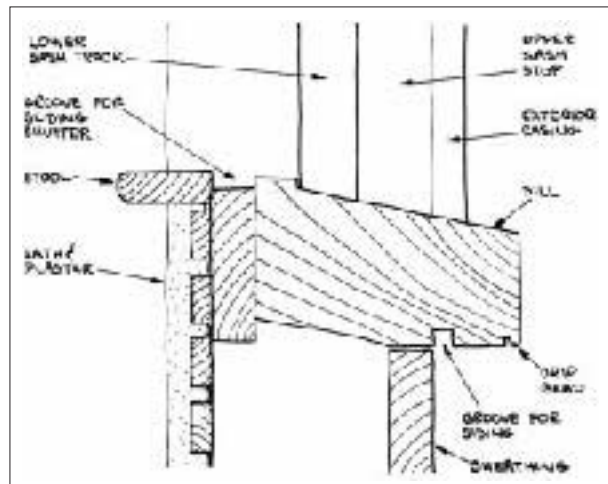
Sill detail for a 1790s frame house. The sill is housed in rabbets in the sides of the frame.
